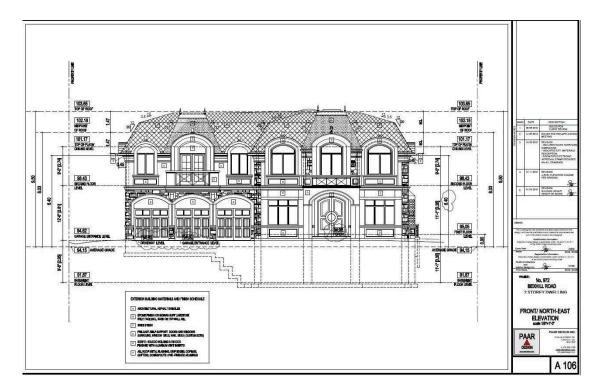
Front Façade, Proposed Development. (Image from owners.)
